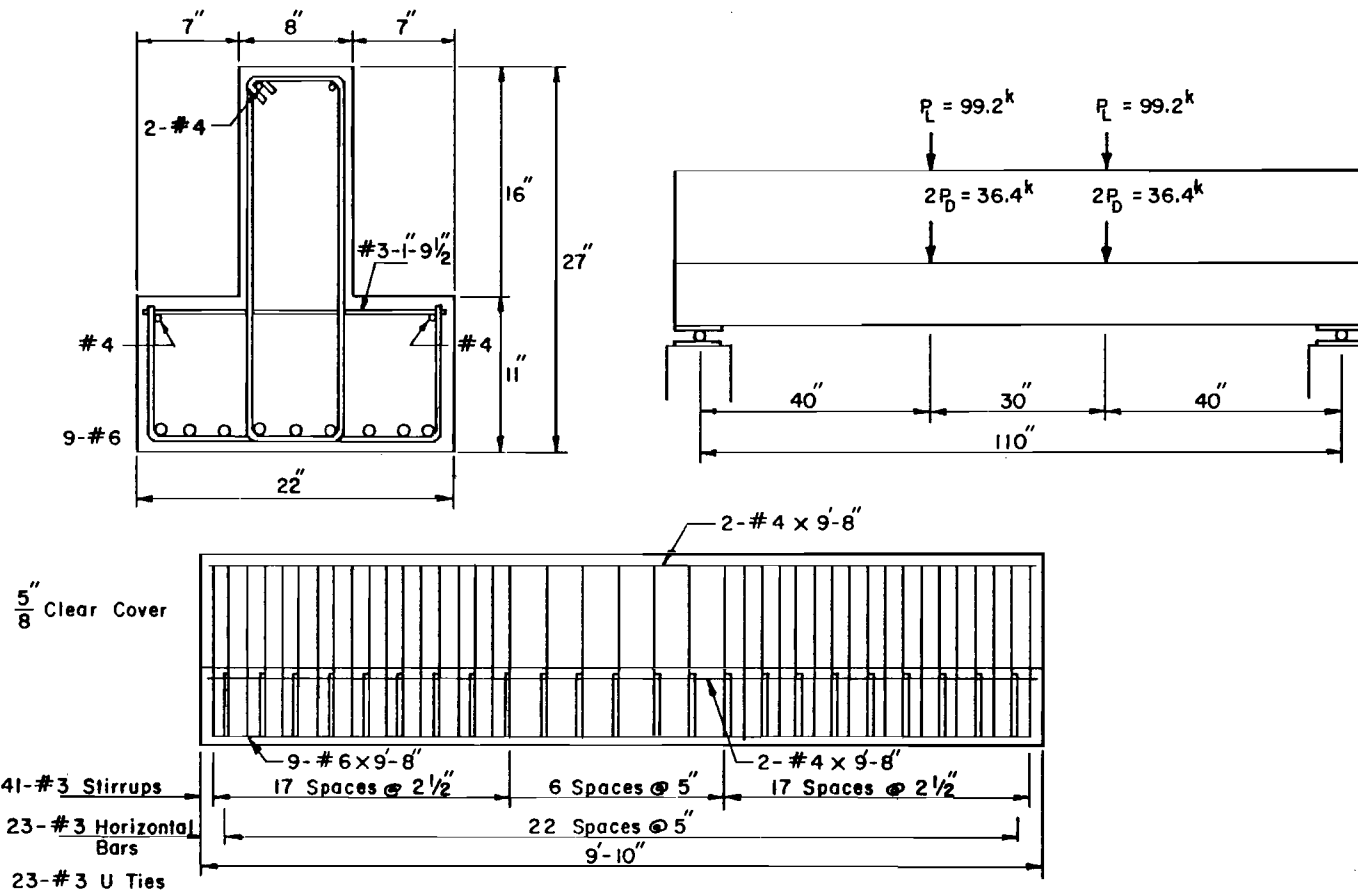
Dimensions, reinforcement, and predicted maximum loads for Beams BMS2 and BMSP2
